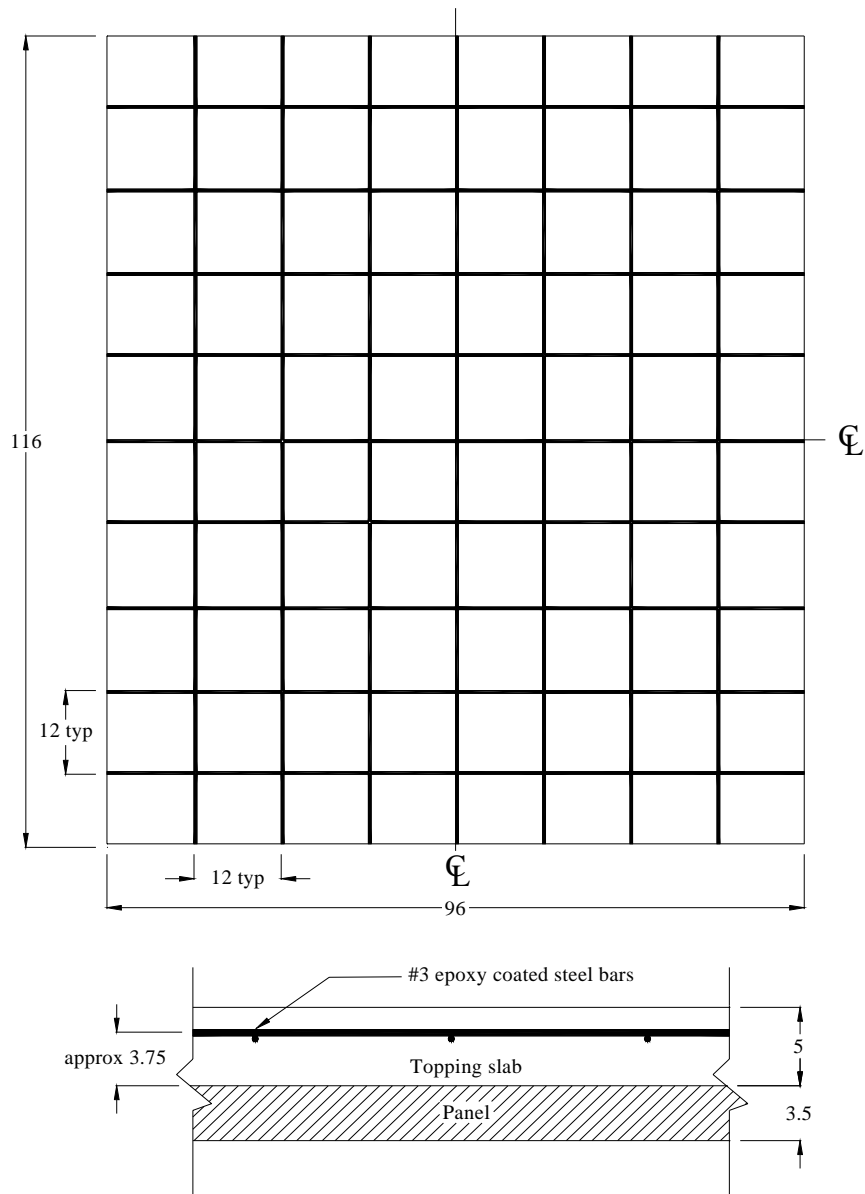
Cross-Section and Plan View of Panel and Topping Slab (all values in inches)
